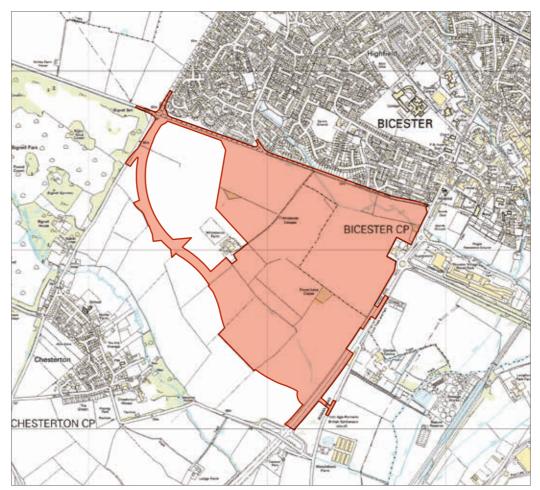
Site location plan. The red line shows the outline planning permission boundary.
